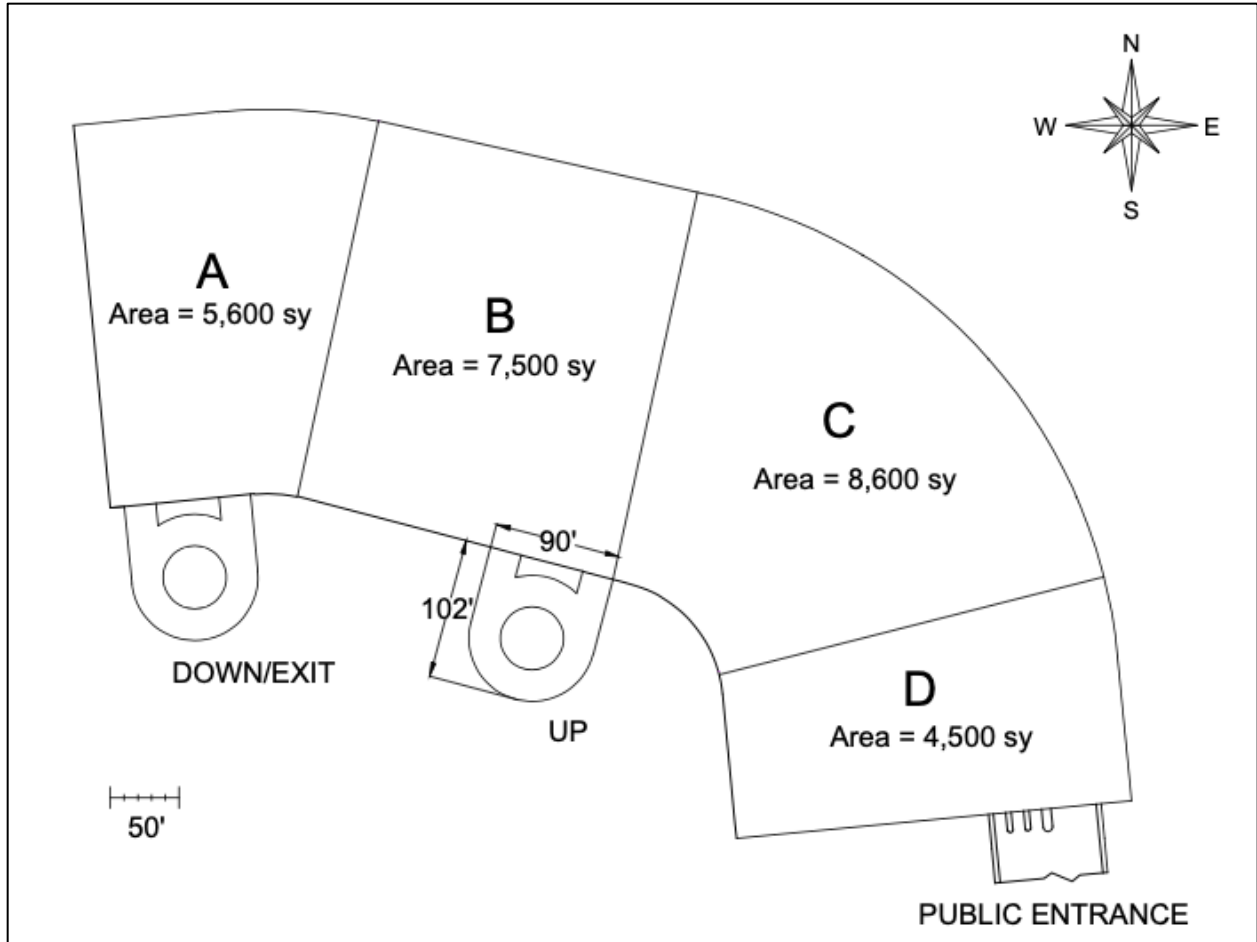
Parking garage layout of the first floor showing each structure A-D location and size, as well as the location and size of the entrance ramp and helix ramps.
